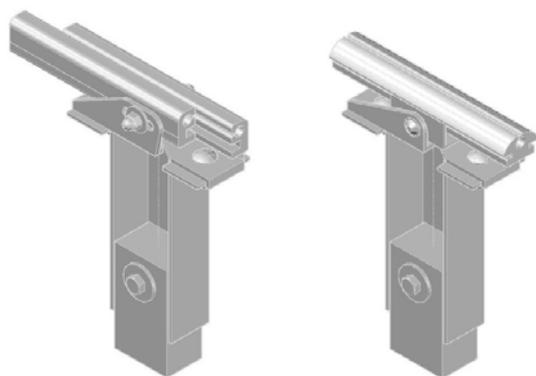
/ Figure 7: stud detail of the steel structure / isometric view attachment and push up detail
